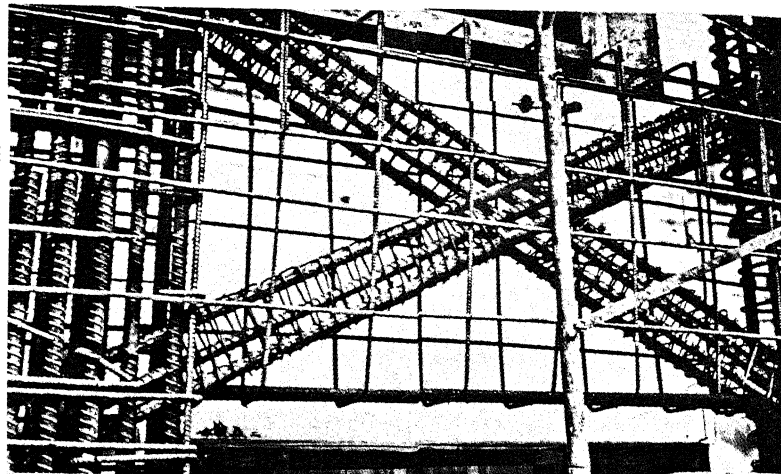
Diagonal Arrangement of the Principal Reinforcement in Coupling Beams. (Note the closely spaced ties around diagonal bars and the nominal basketing reinforcement in the remainder of the beam.)
